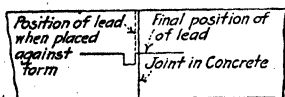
Queen Lane Reservoir, Philadelphia. Expansion joint in floor.
